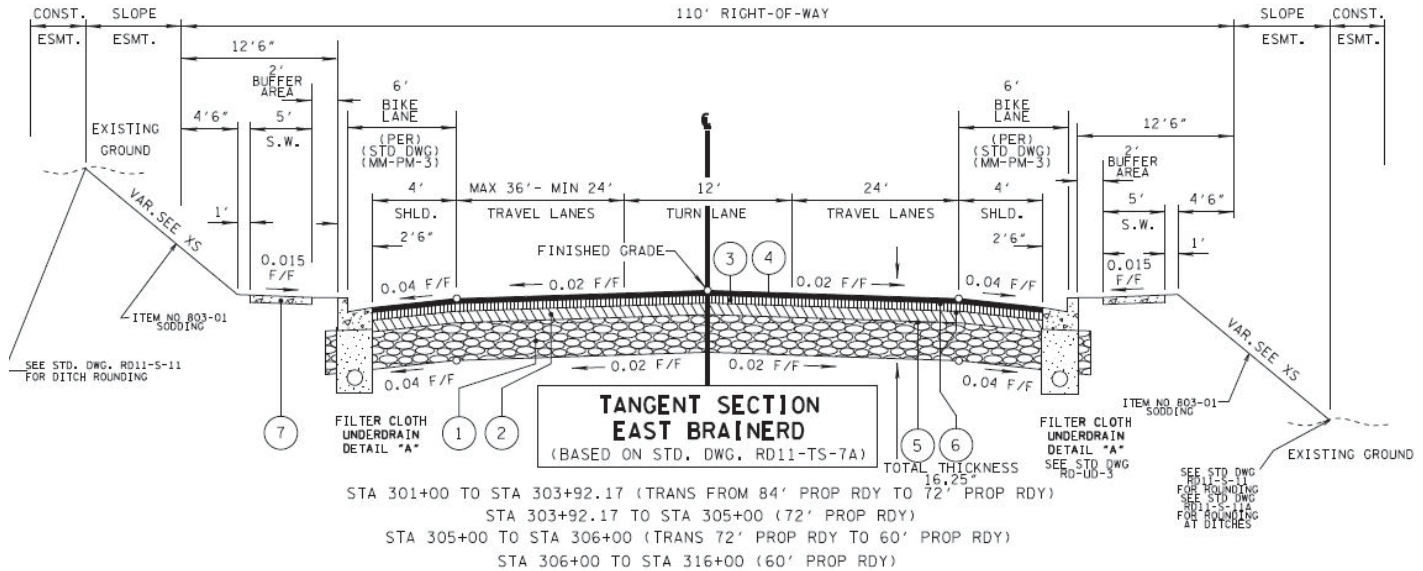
Typical Section of SR-320 east of the intersection with SR-321 (05/12/2020 ROW Field Review Plans, Sheet 2B1)
